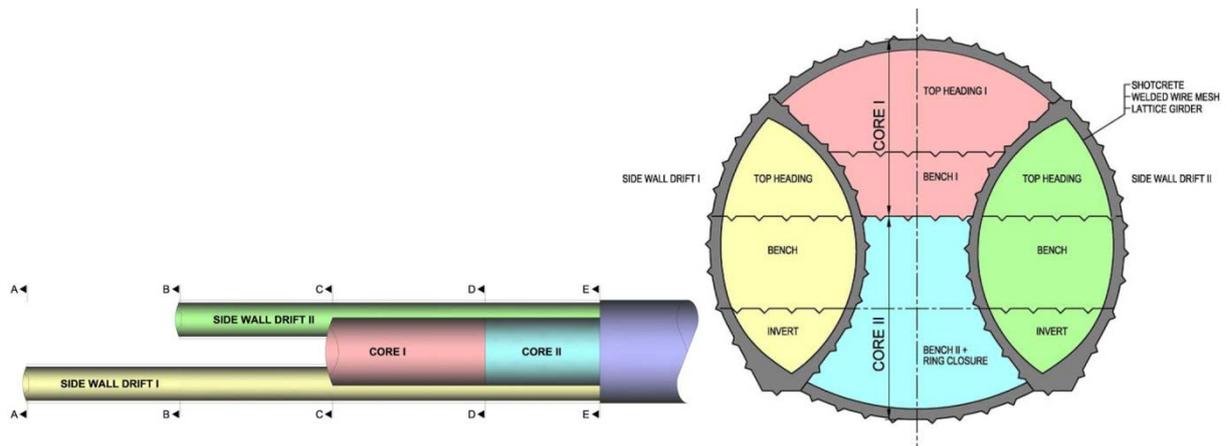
Side wall drift excavation method (The Austrian Practice of Conventional Tunnelling, 2009)
